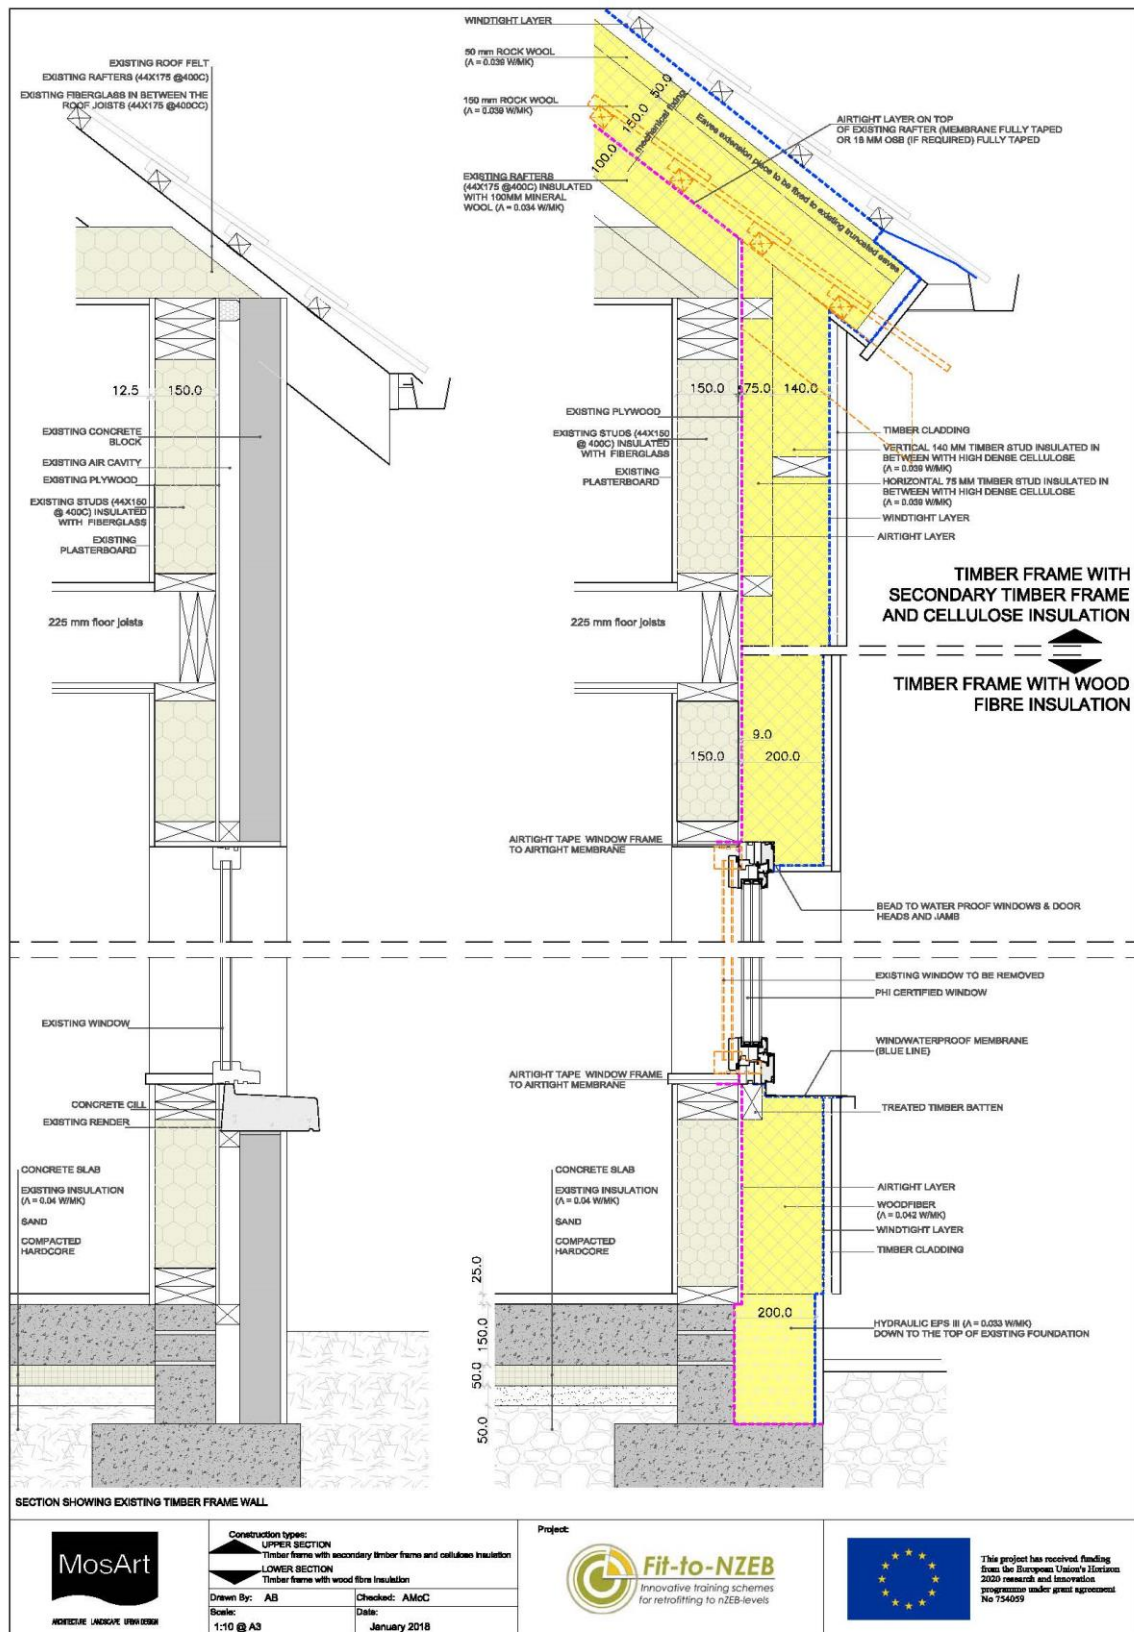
Upgrading a timber frame wall involving removal of external block leaf and directly insulating the timber frame structure with an external insulation finishing system.
